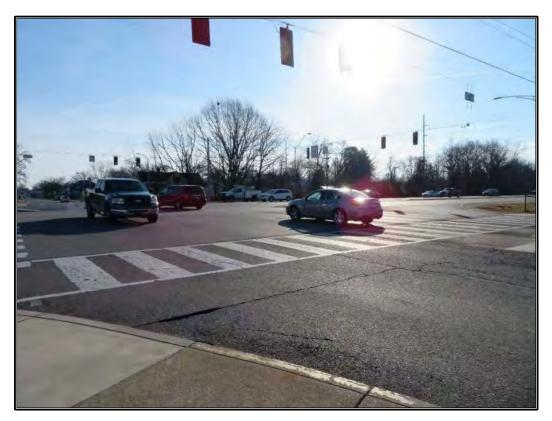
Overview of project area at the intersection of US 41 and Washington Avenue, facing southeast.
